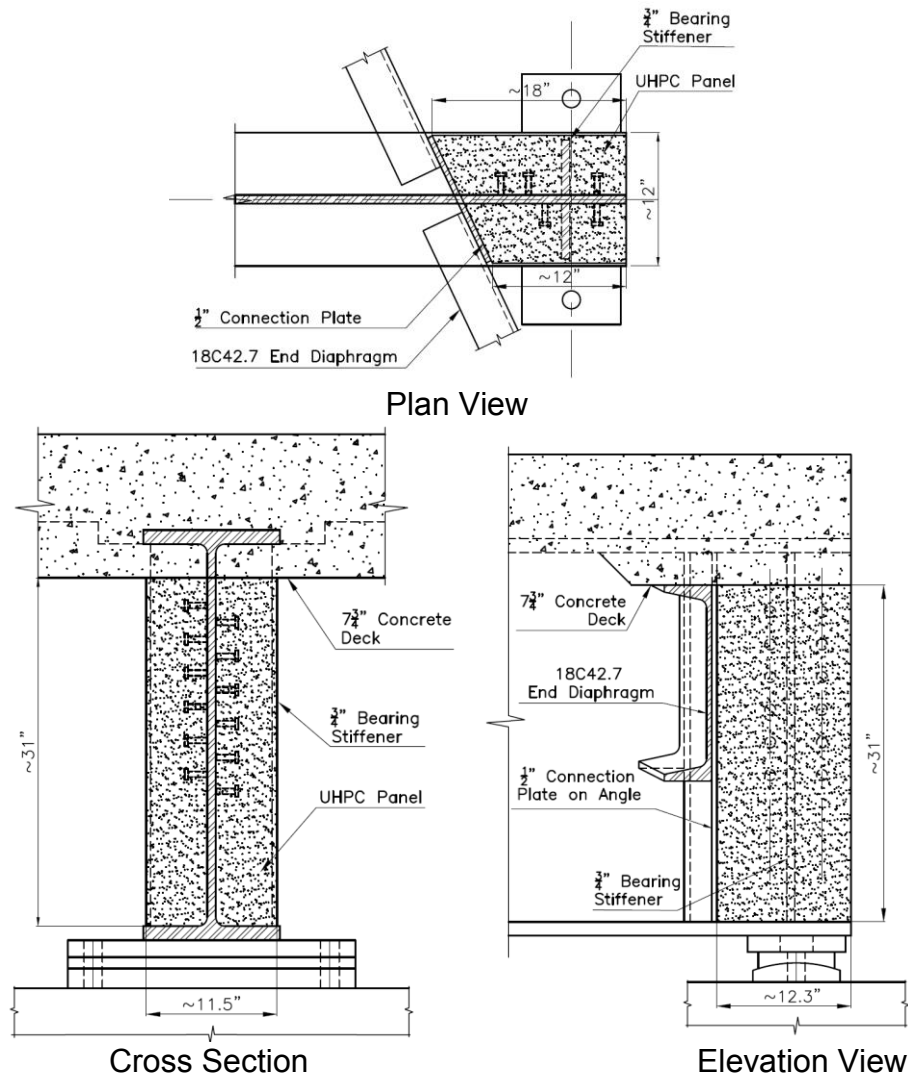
Proposed UHPC repair panel for corroded steel girder
